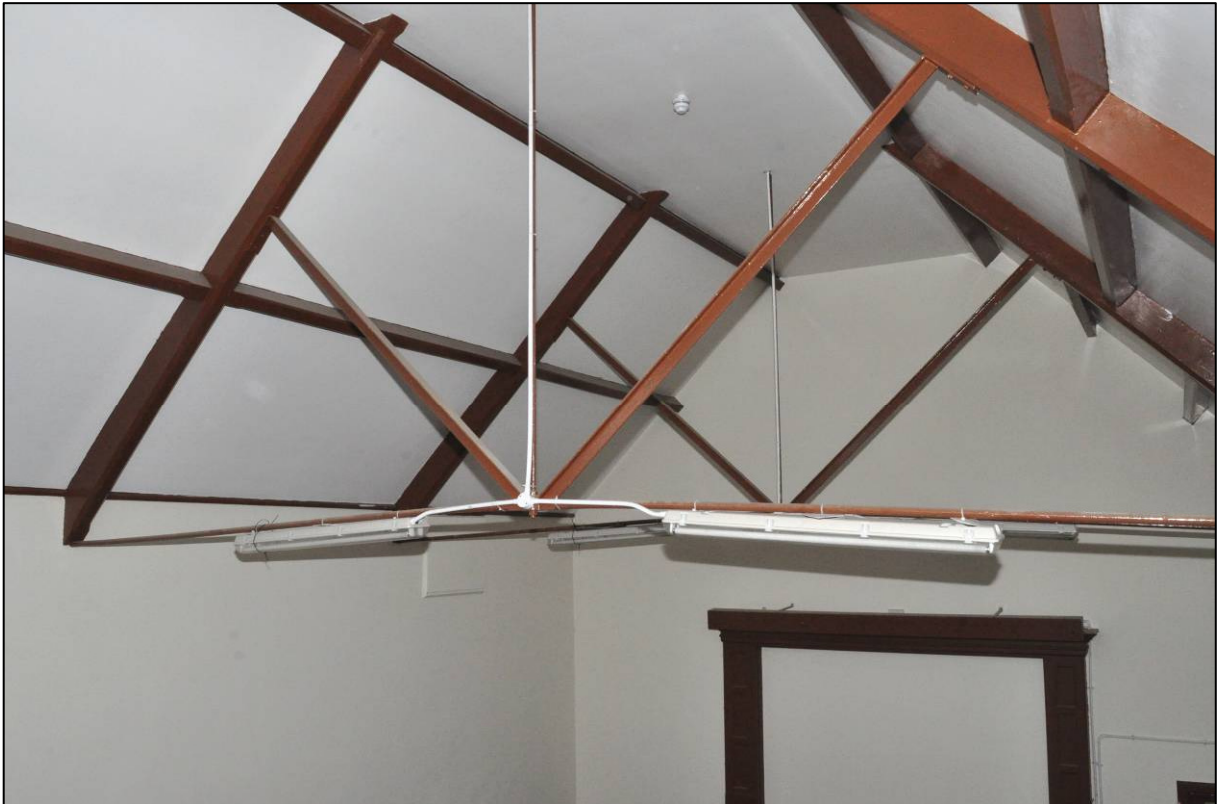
1895 Higher Grade Boys' School, lecture theatre (2F5), roof truss, looking W (photo 2301).
